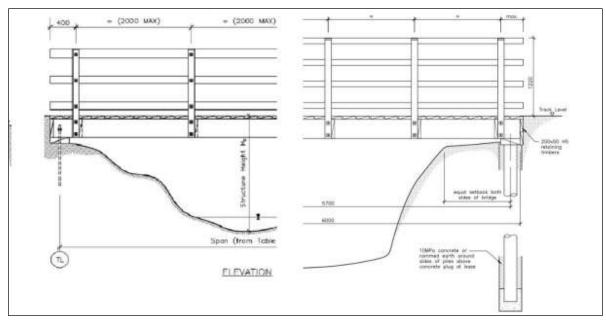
Examples of standard bridge structure (Cropped from DOC drawings)
